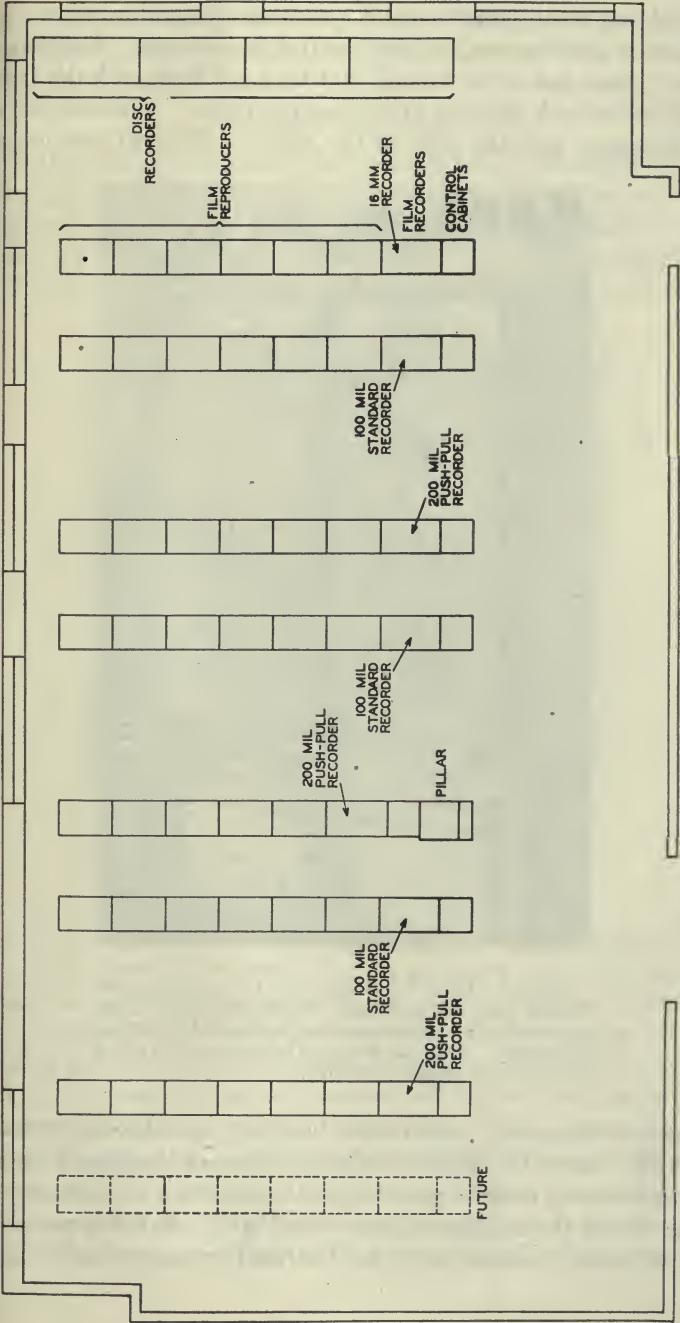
Floor plan of the MGM re-recording equipment room showing arrangement of re-recording recorders and reproducers
